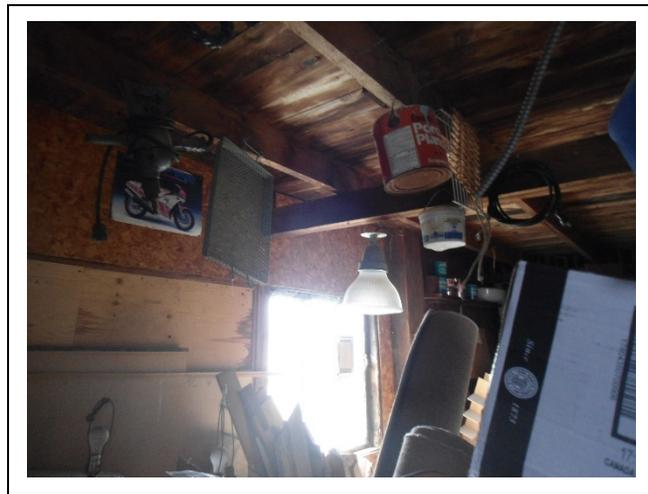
E20 - View of the first floor the exposed ceiling structure in the storage area
